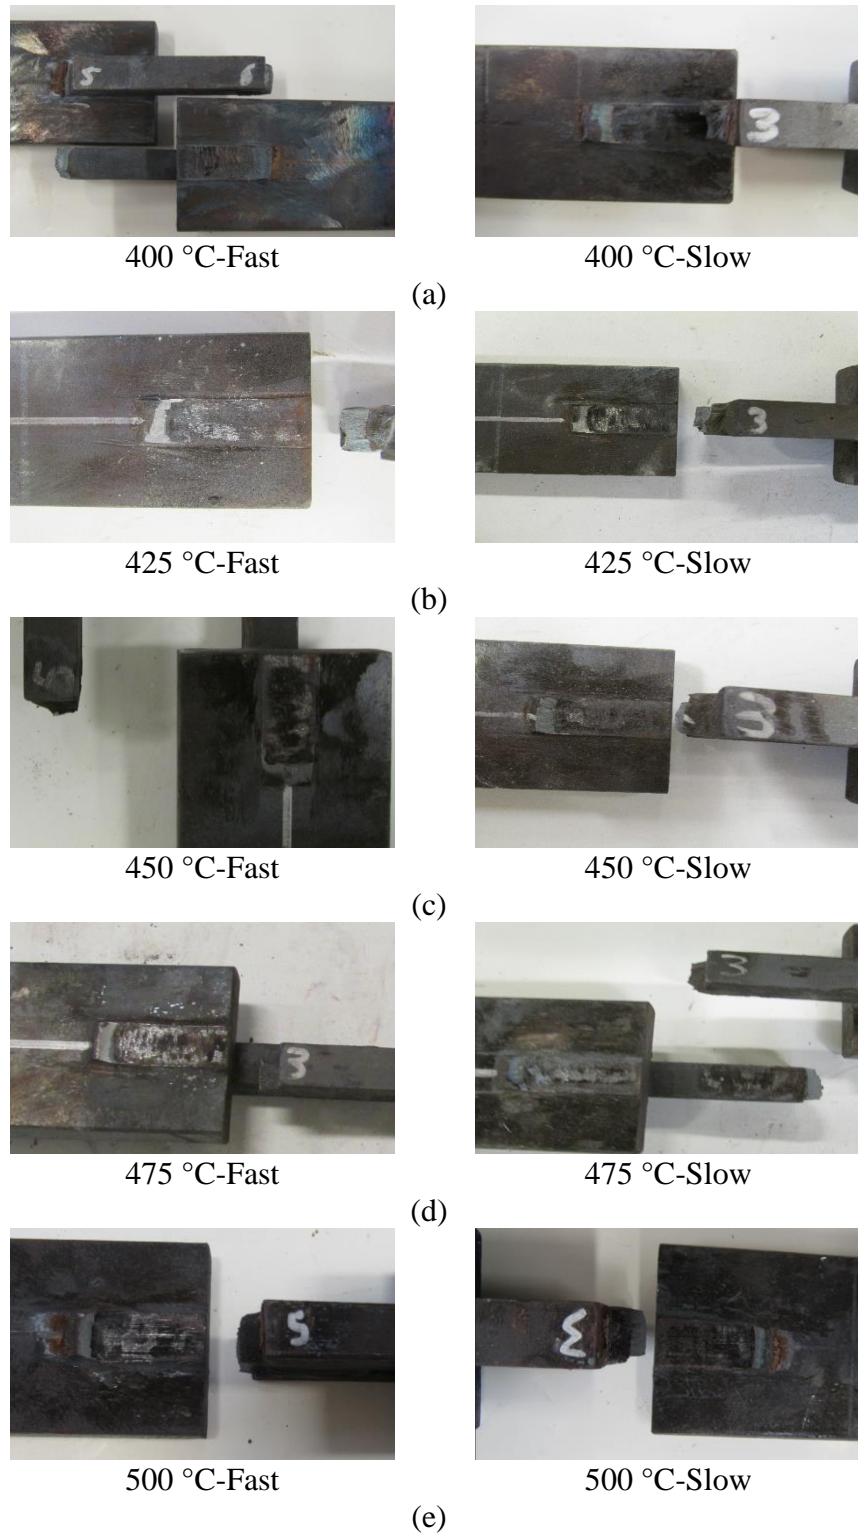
Fracture surface at the weld region for the welded specimens at: (a) 400 °C, (b) 425 °C, (c) 450 °C, (d) 475 °C, (e) 500 °C
